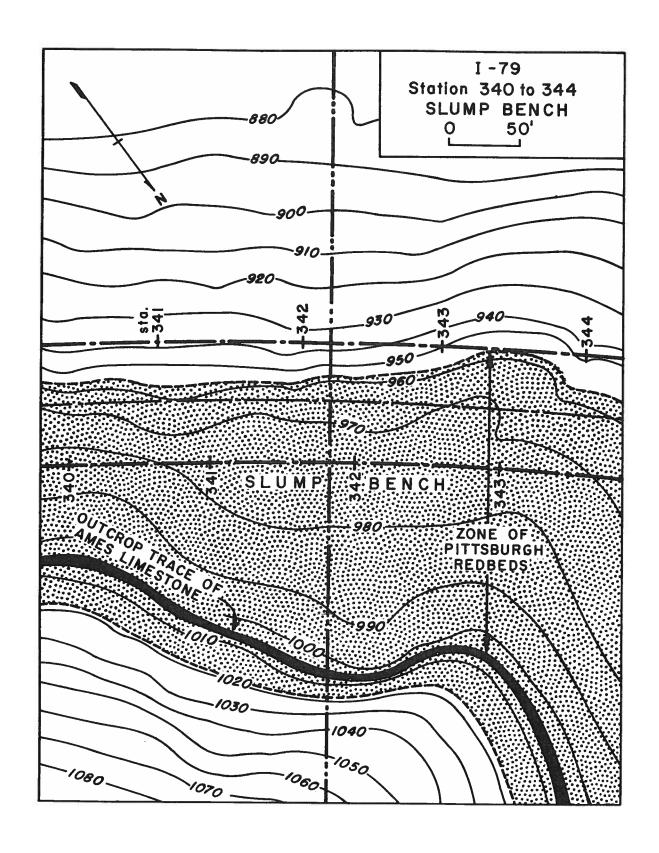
I -79 Station 340 to 344 slump bench
